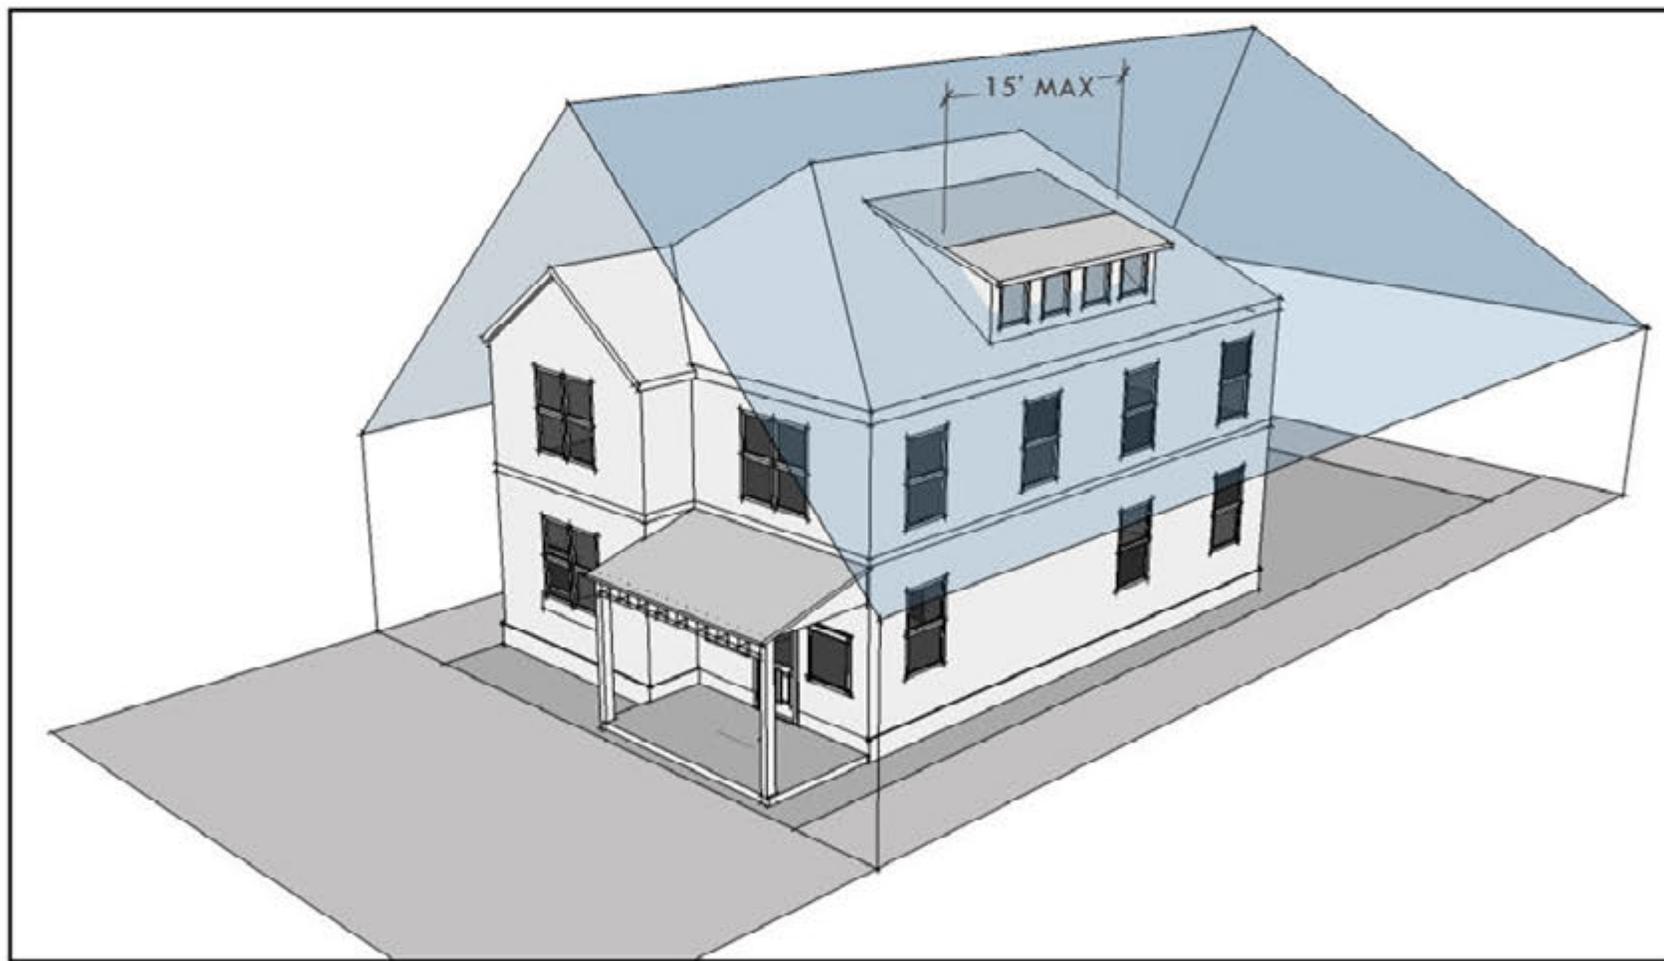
Buildable Area (Combination of Yard Setbacks, Maximum Height Limit, and Setback Planes)
